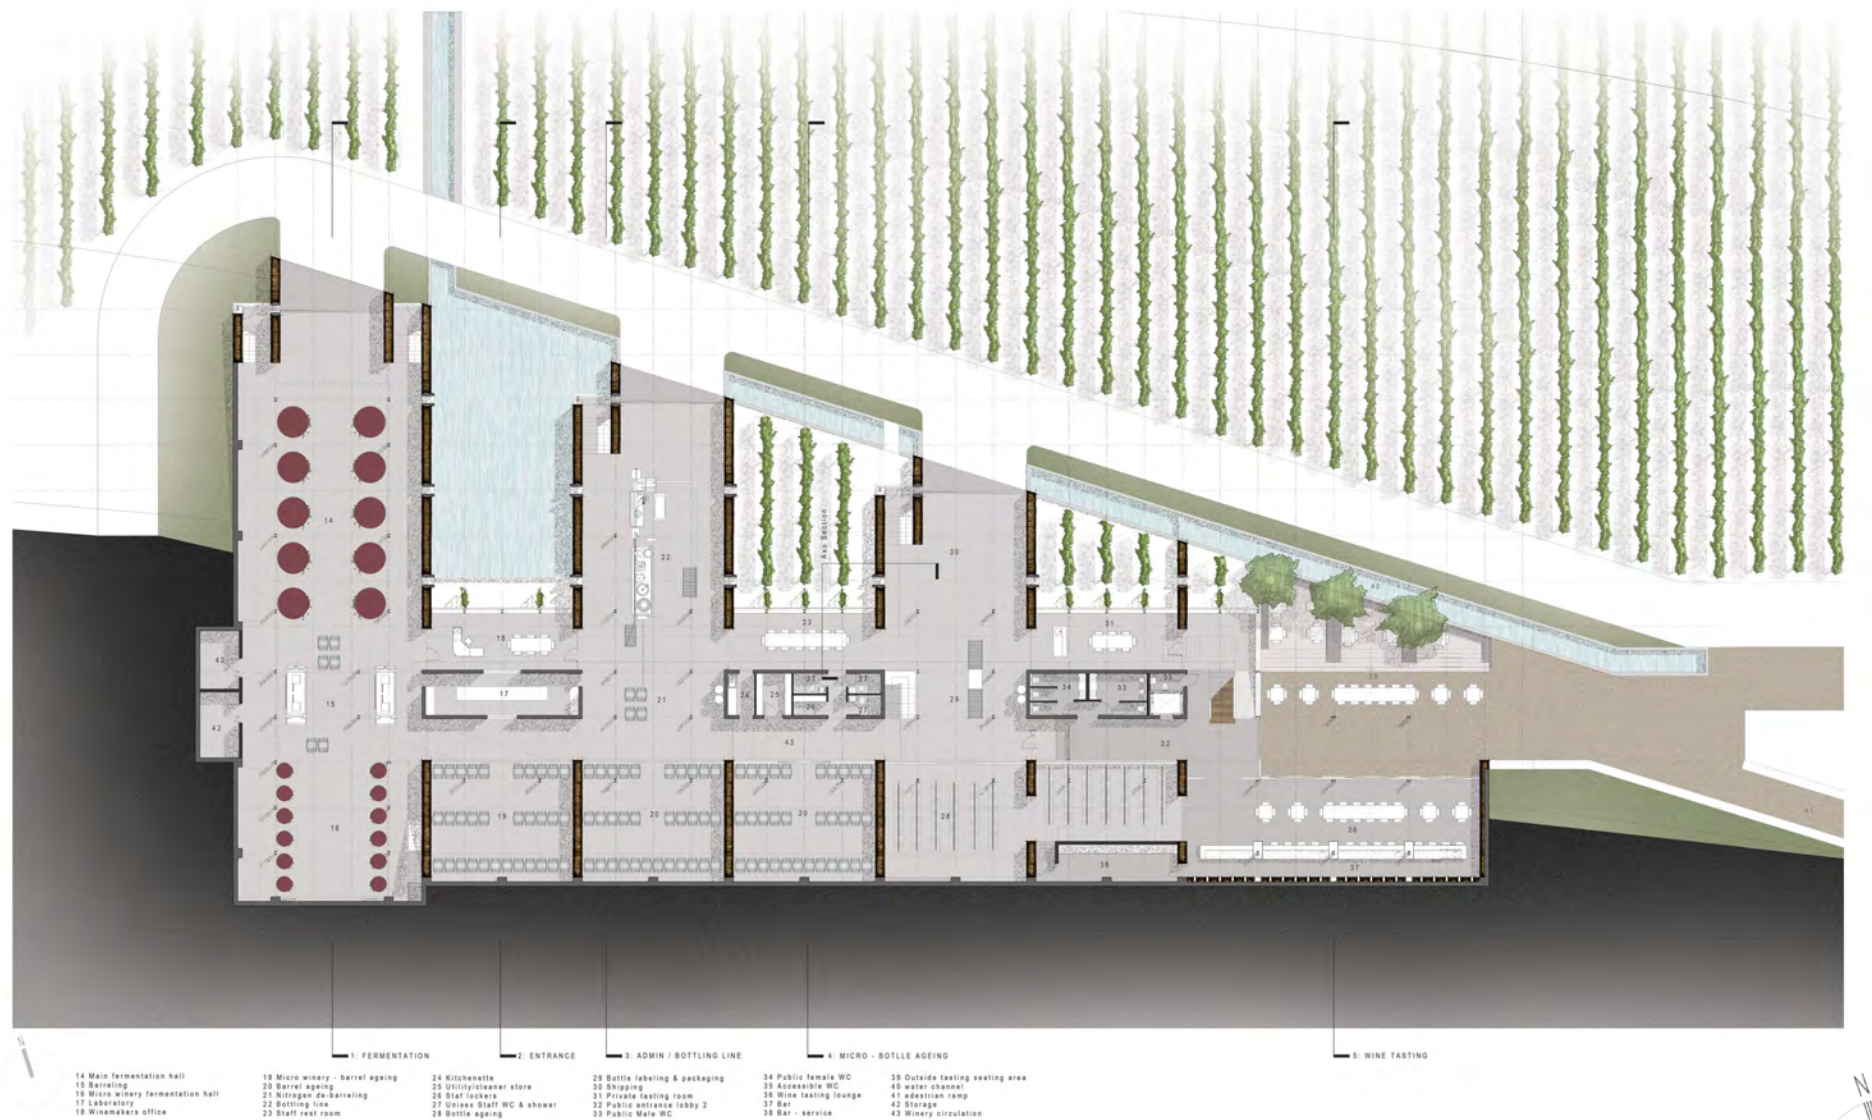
(ABOVE): Ground floor plan - Entry level from pedestrian spine
